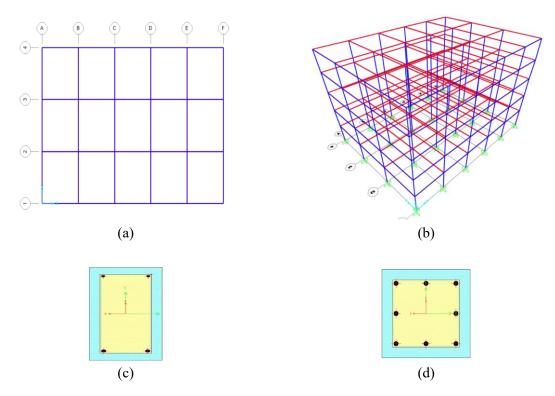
(a) Plan, (b) 3D view of building, (c) Typical beam c/s, (d) Typical column c/s.
